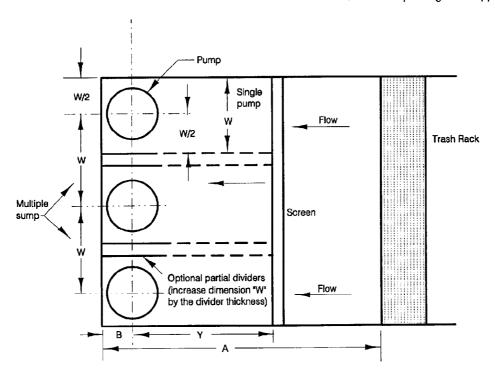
Sump dimensions, plan view, wet pit type pumps
